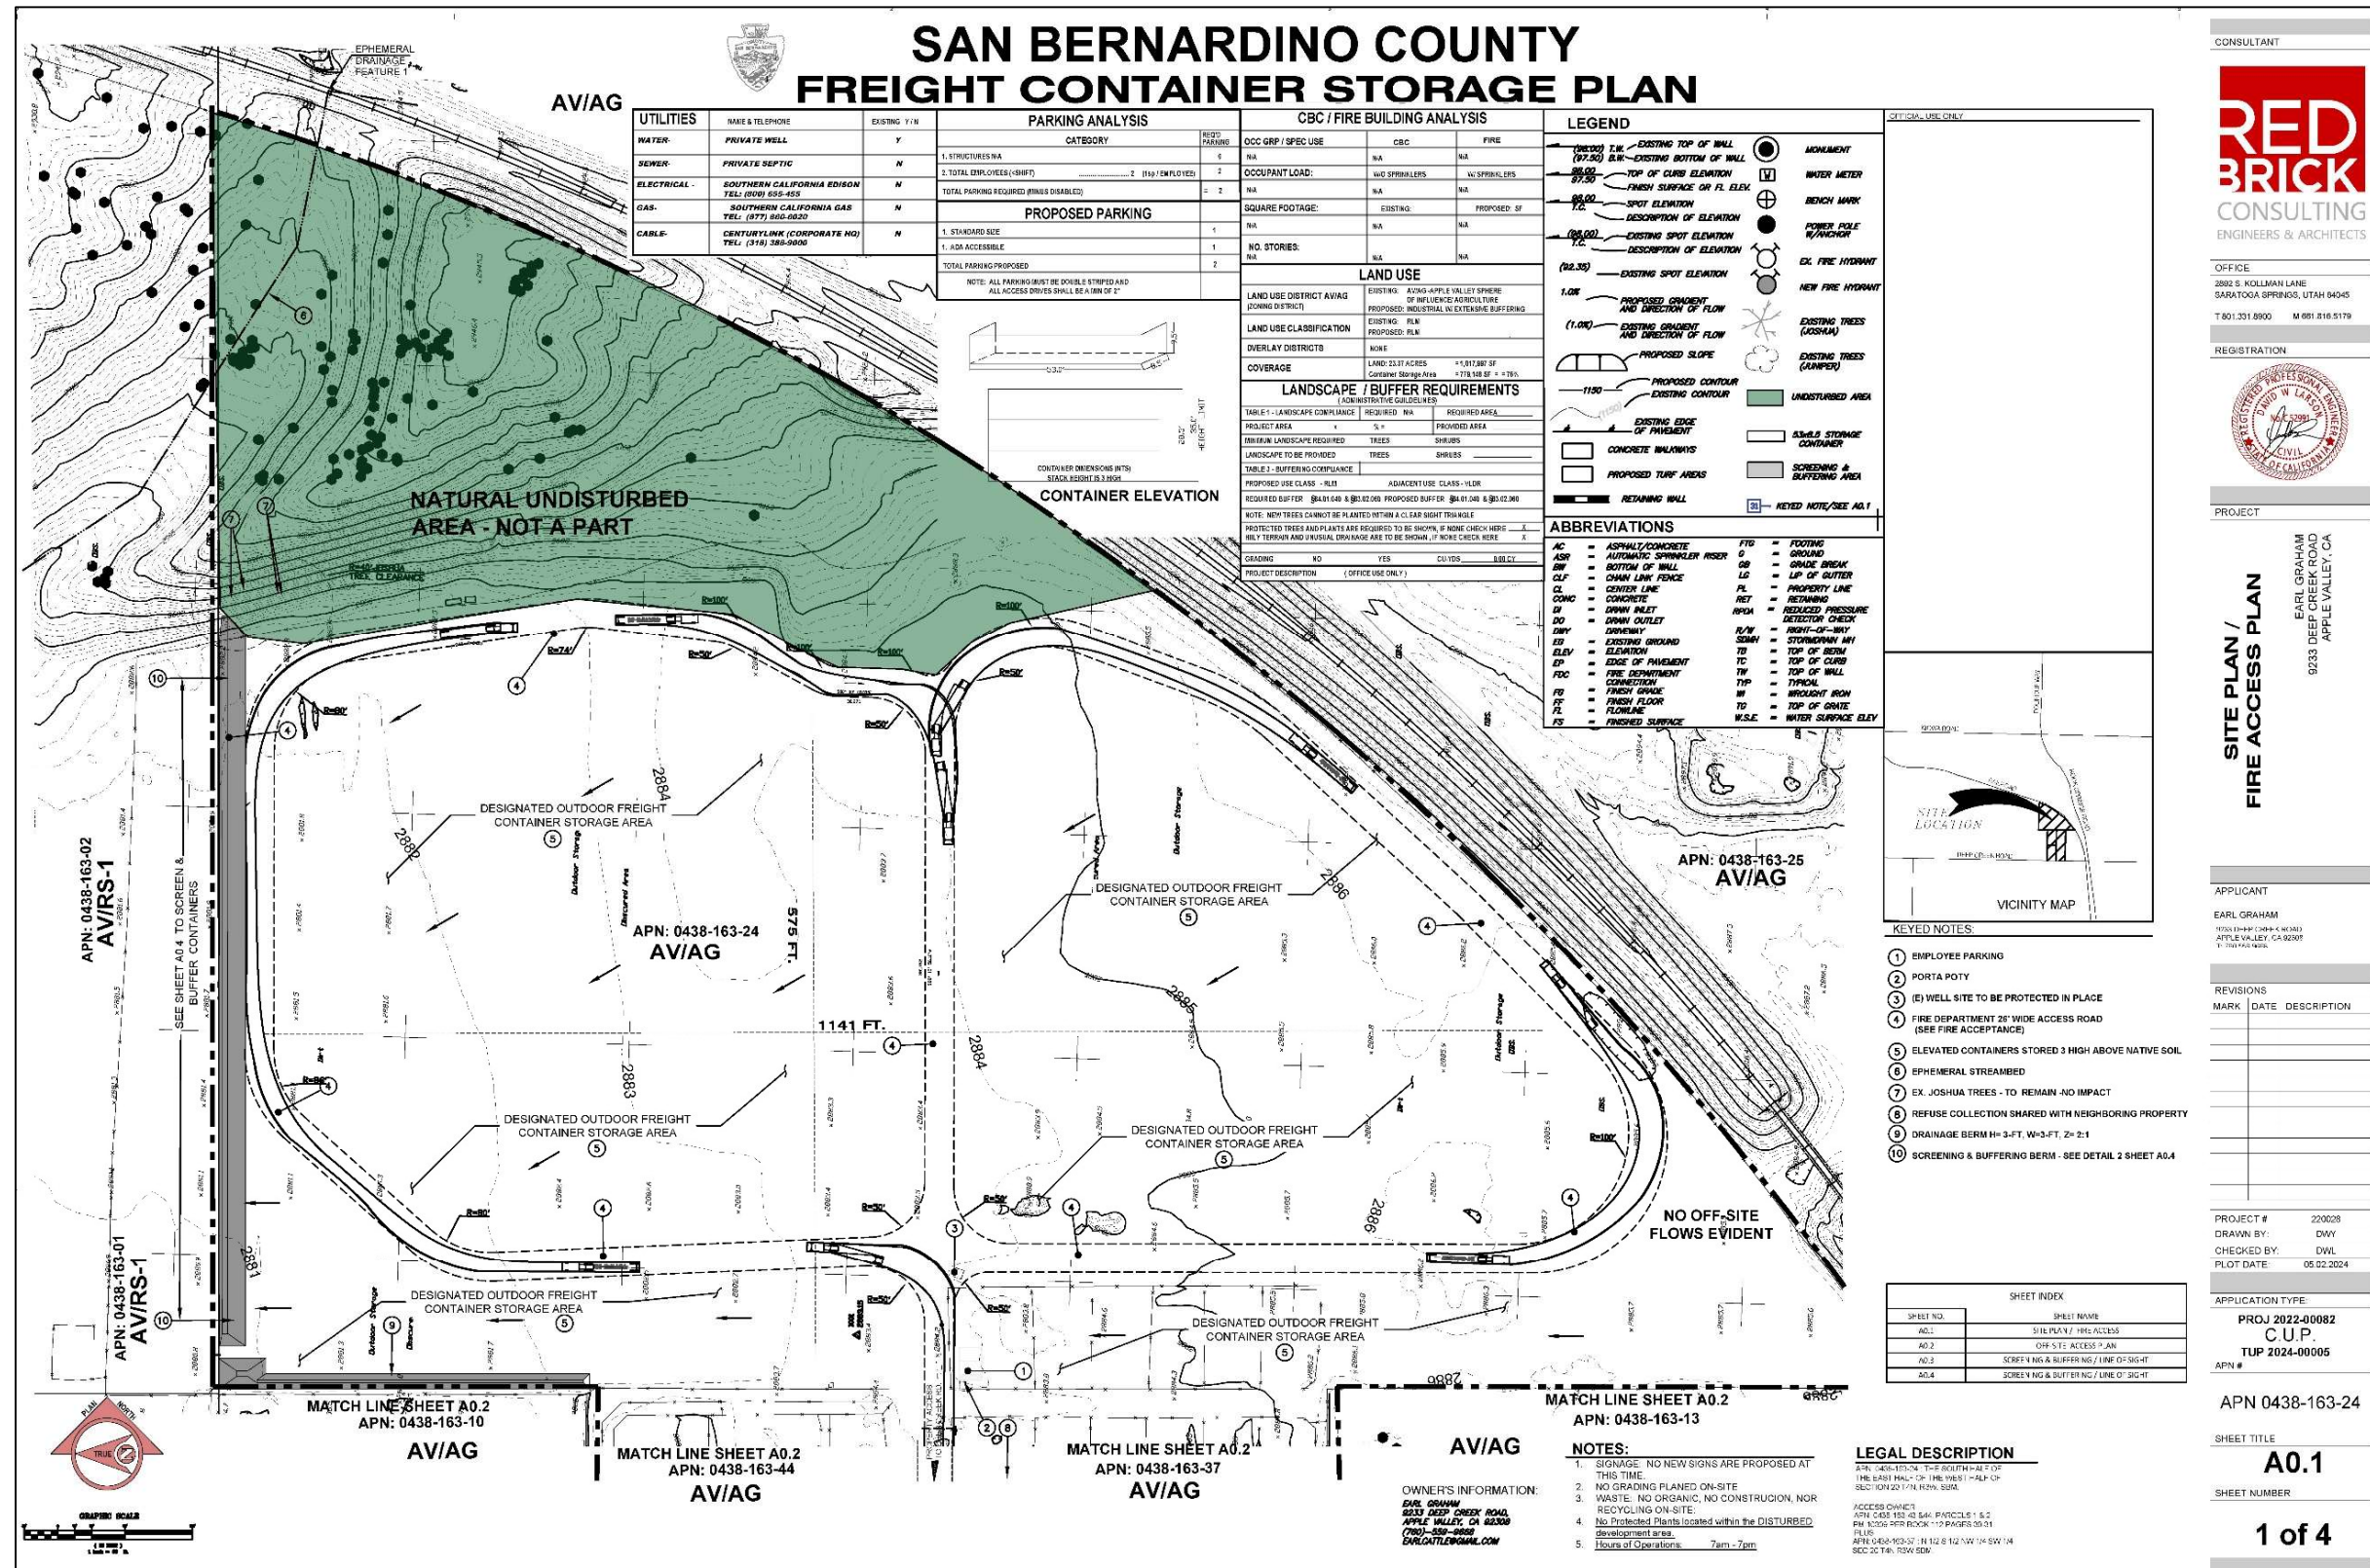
SITE PLAN AND FIRE ACCESS PLAN
